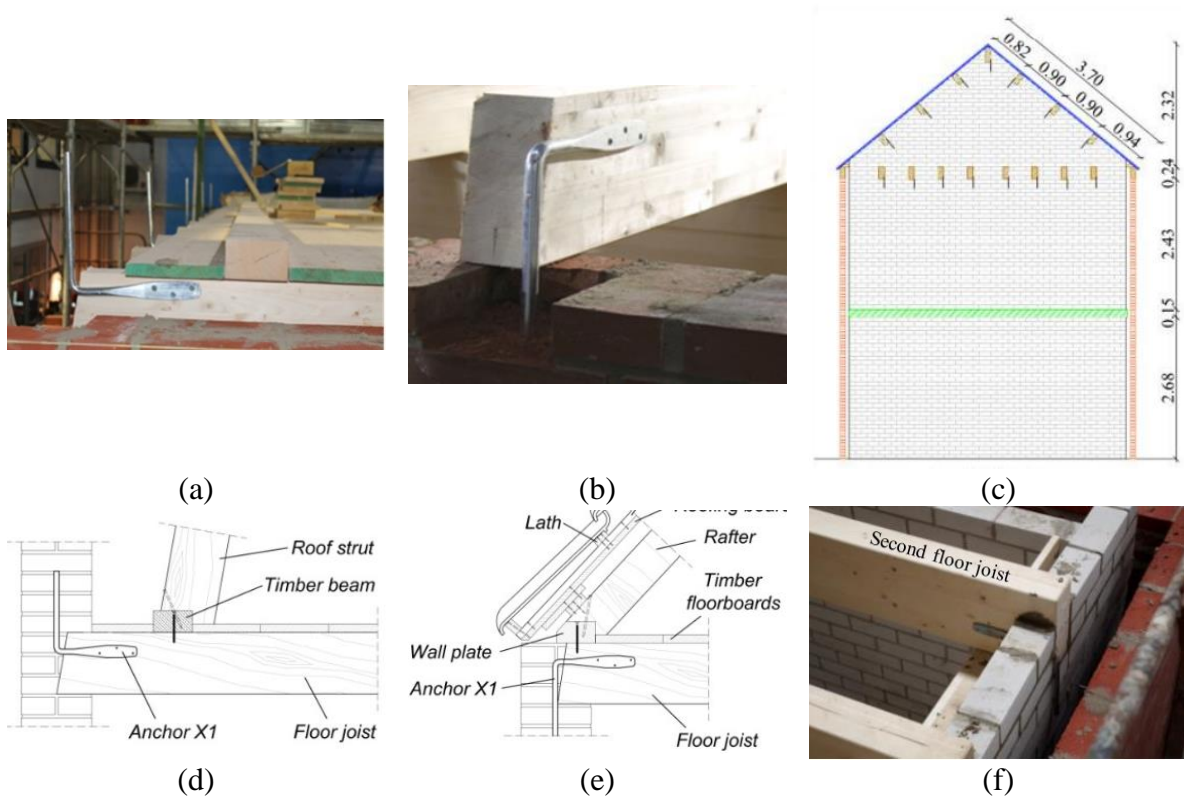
Wall-to-floor connections: hook anchor embedded in the double-wythe clay wall (a,b,d and e) [11], and detail of the anchor placed on the inner leaf of a cavity wall (c and f) [100].
